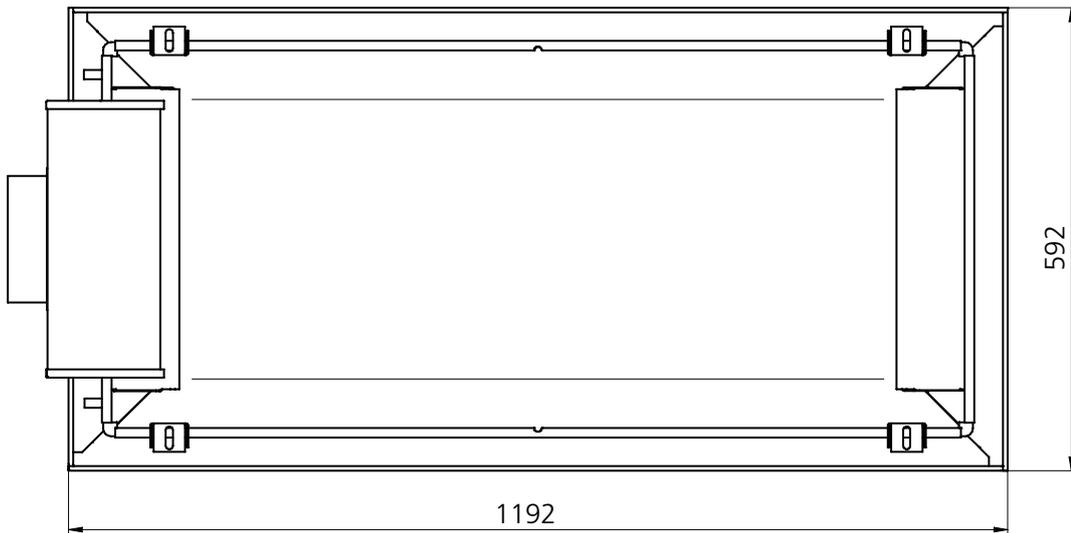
Dimensional drawing, view from above. Air connection on the short side - pos 1.
